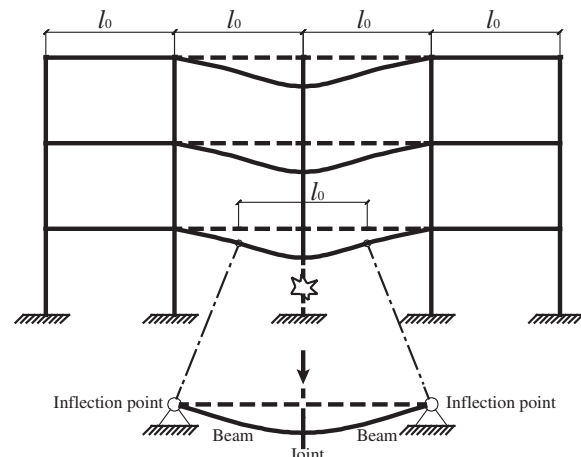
A beam-joint-beam assembly extracted from a frame structure.
